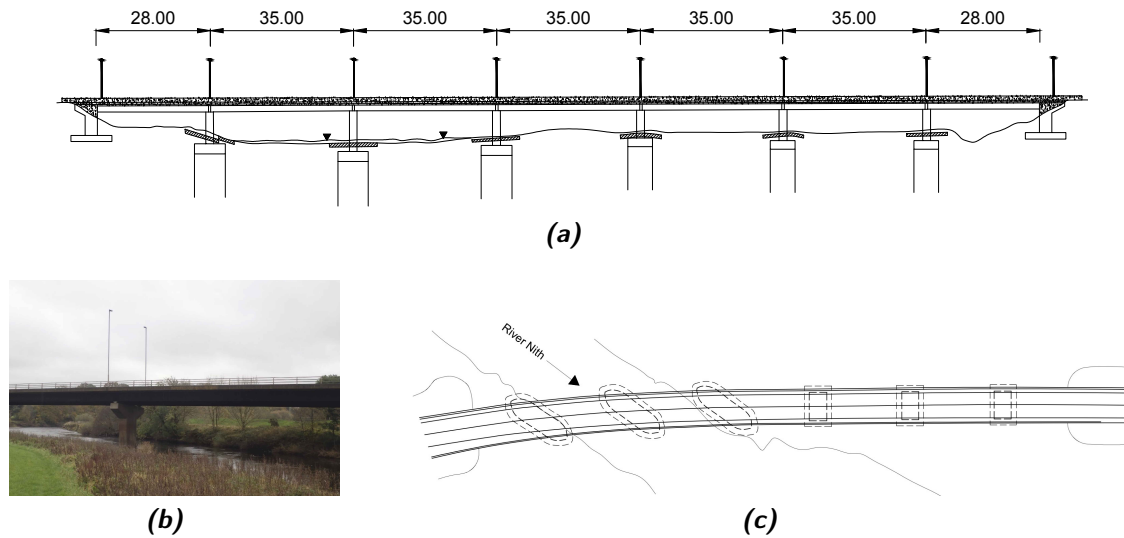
(a) Bridge elevation, (b) A75 300 Dalscone bridge and (c) and plan view
